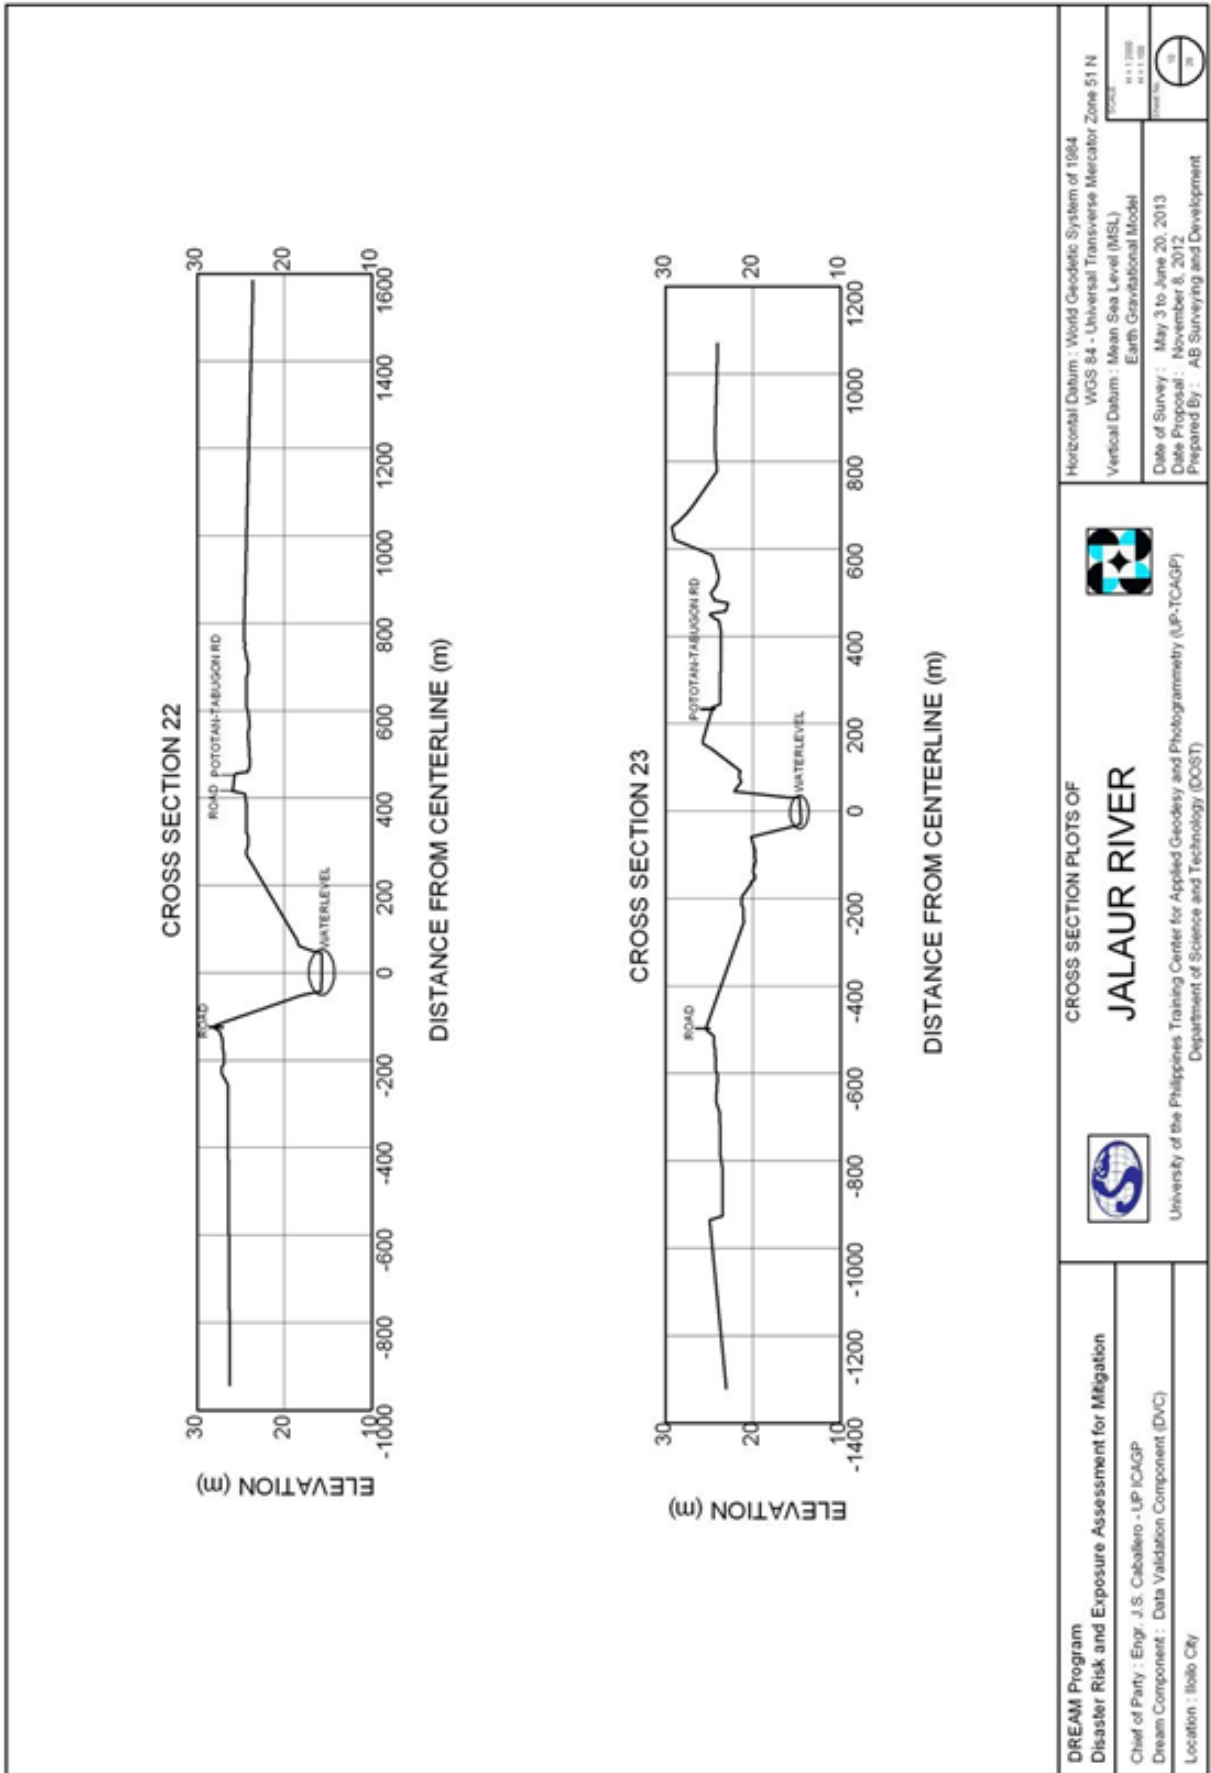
Sheet No.10 of the Cross-section plan of Jalaur River
